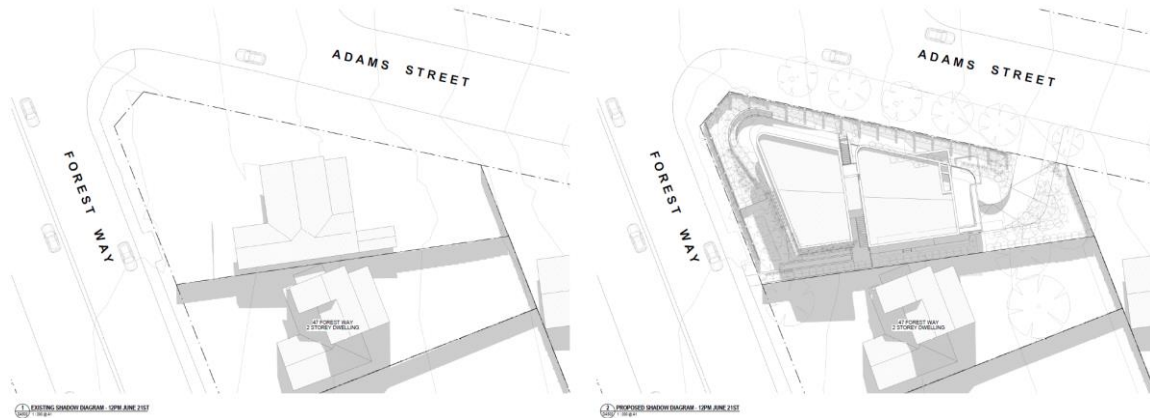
the existing and proposed shading impact to the southern adjoining development at 12pm
